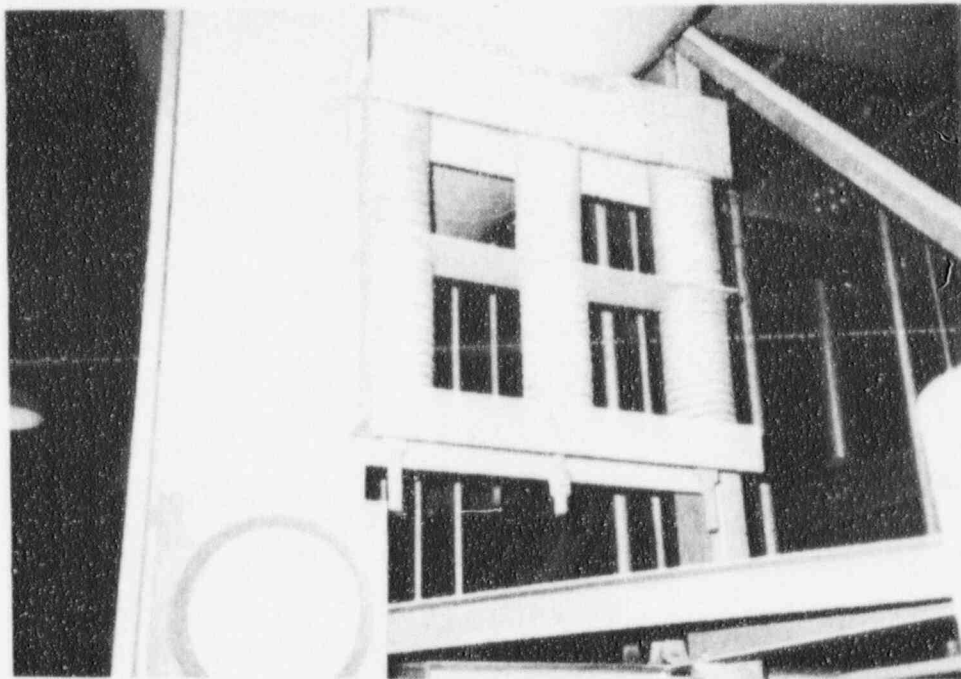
Field Fabricated Spring Hanger in Kern Unit 1
